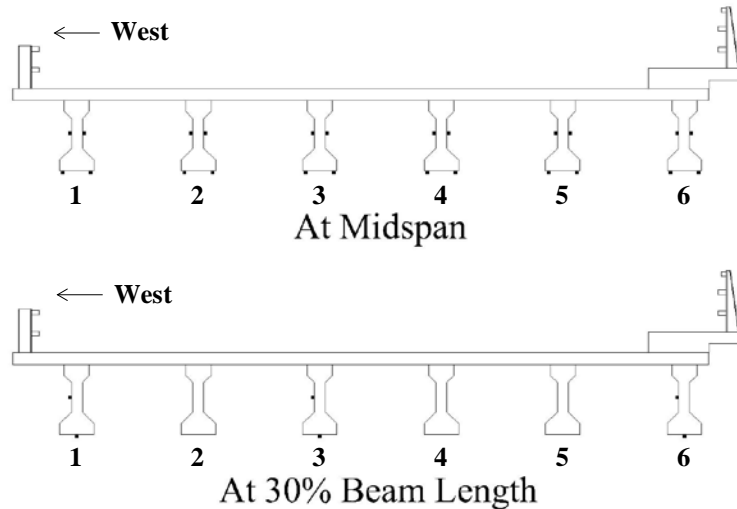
Instrumentation layout for proof load testing (Bridge 8588).
